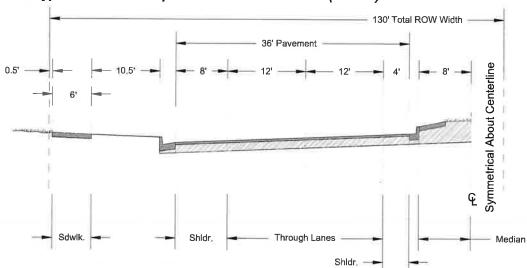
Typical Urban Principal Arterial Cross Section (4 Lane)
